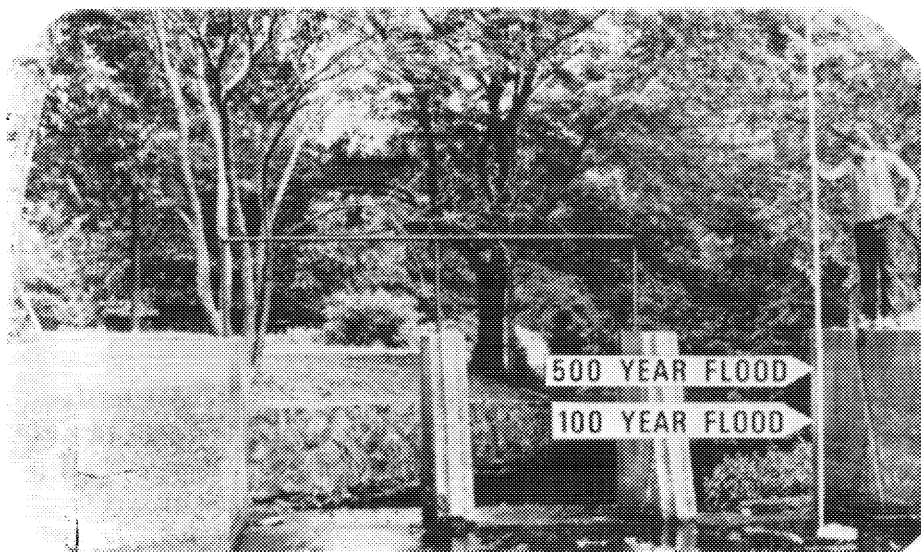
Queset Brook, Station 34+00. Future flood heights at breached spillway of Dean Pond, Site A.
